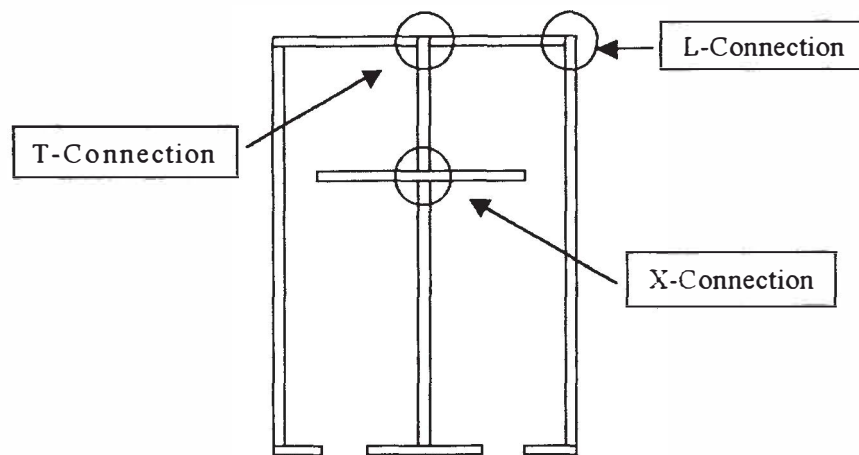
Plan Of Typical Precast Load Bearing Wall Structure
